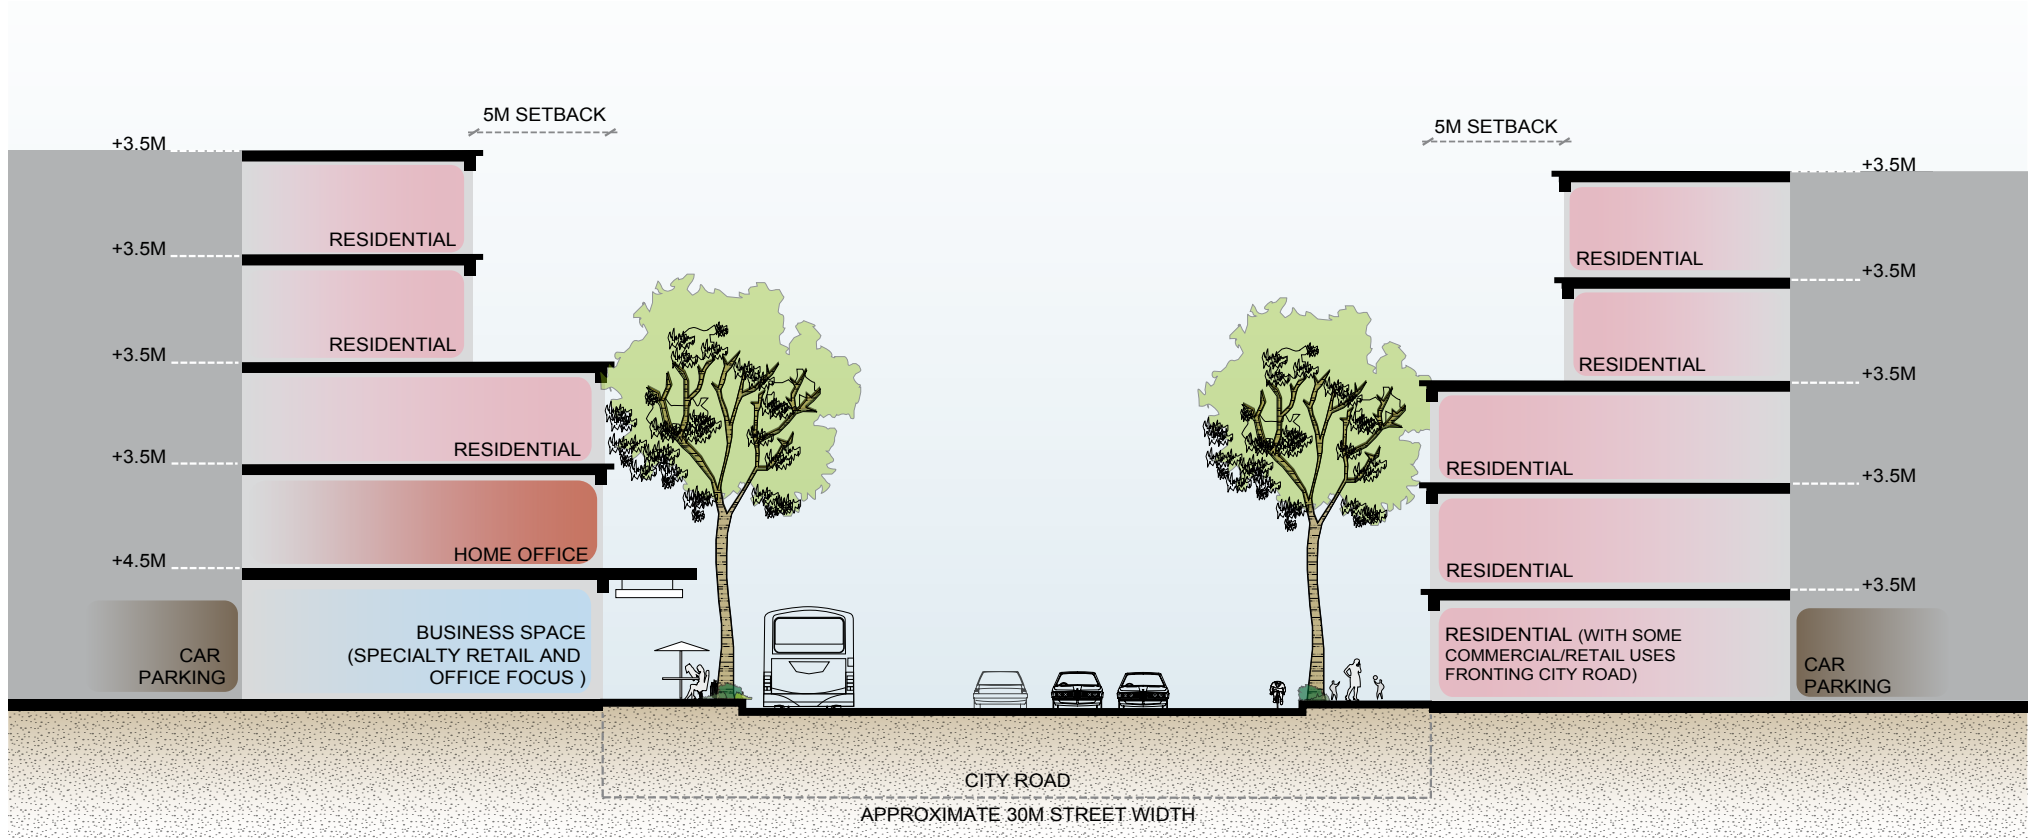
PROPOSED HEIGHT AND SETBACKS FOR THE CITY ROAD CORRIDOR (BETWEEN MONTAGUE STREET AND FERRARS STREET)
